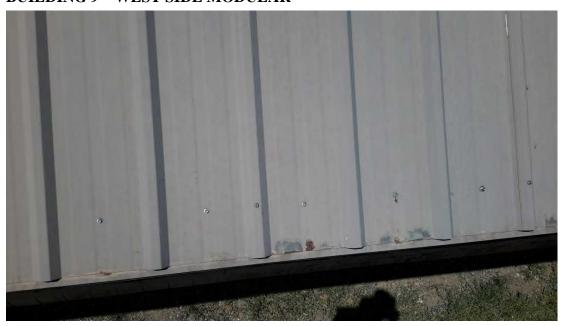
Building 9 - paint peel and corrosion on east eave
